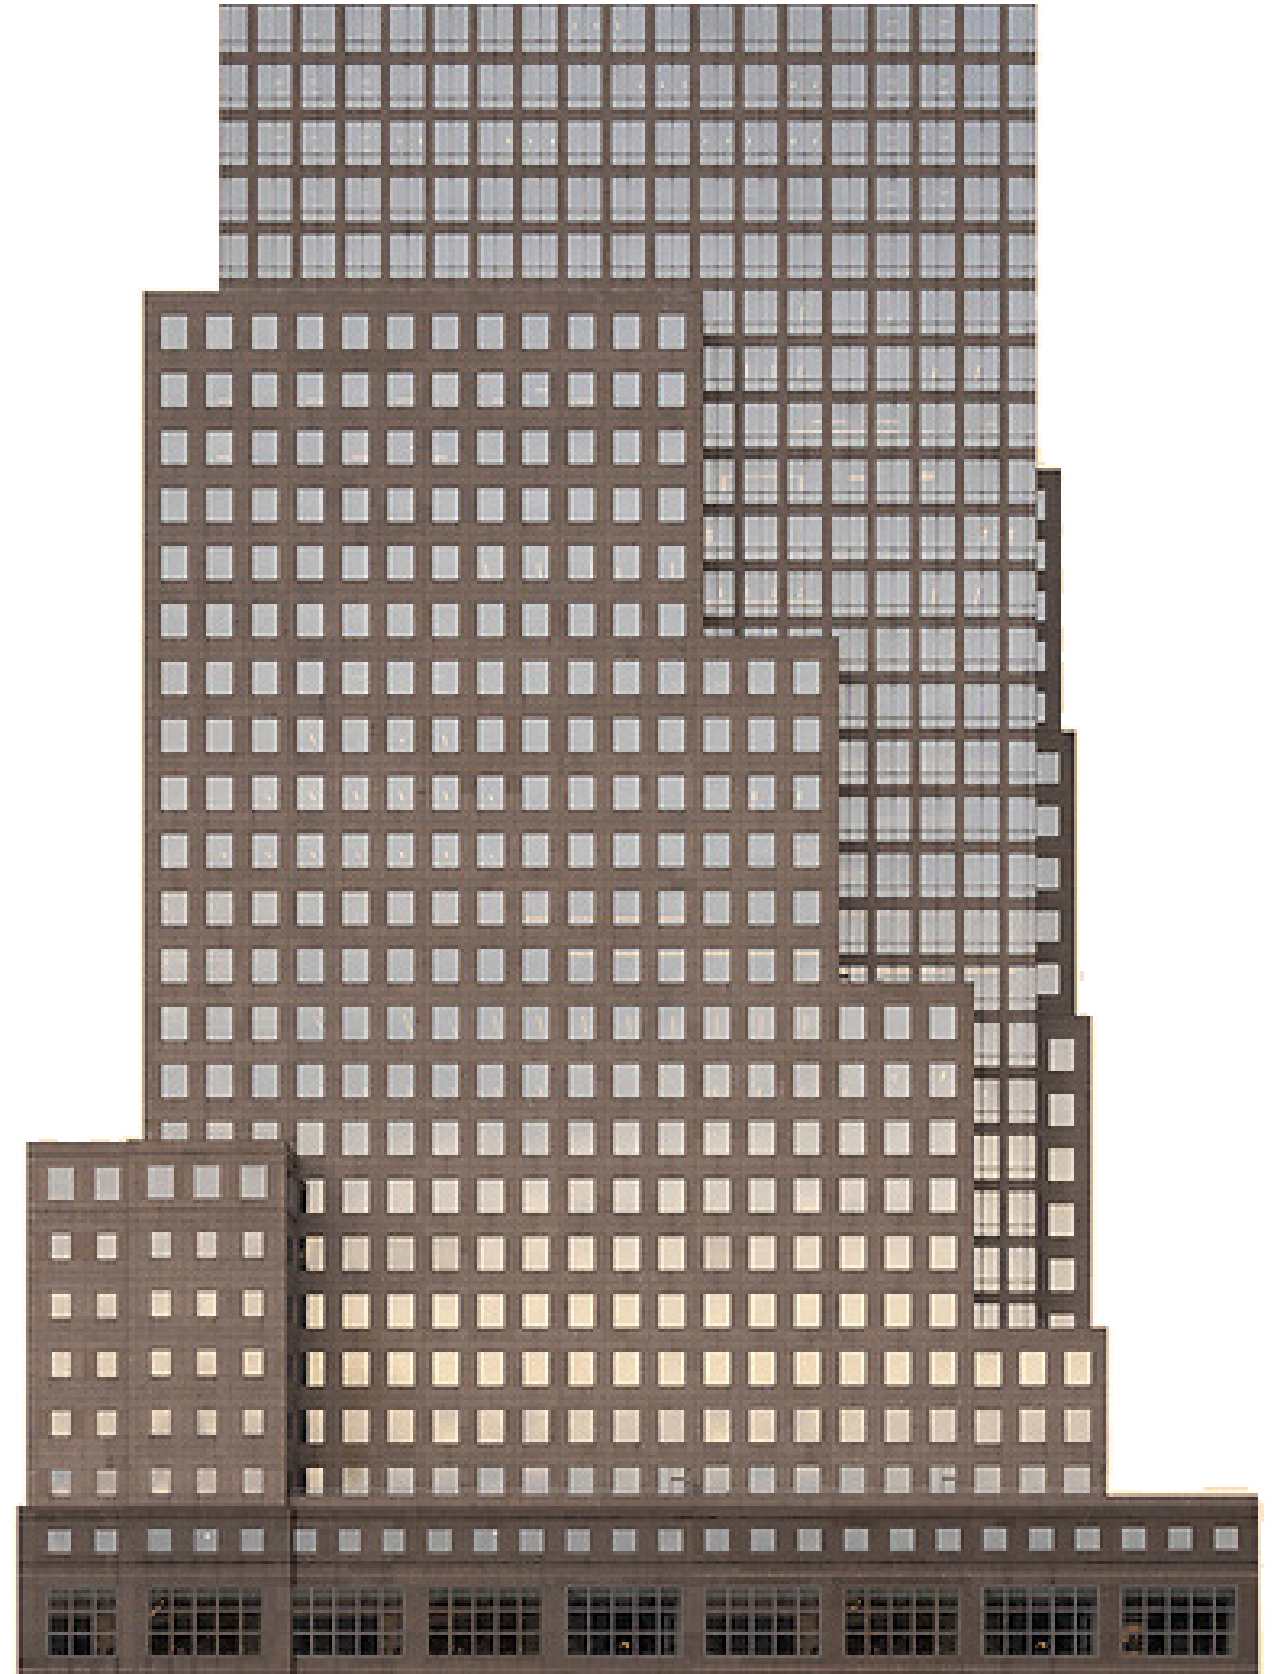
Existing base of 200 Vesey Street in elevation.
